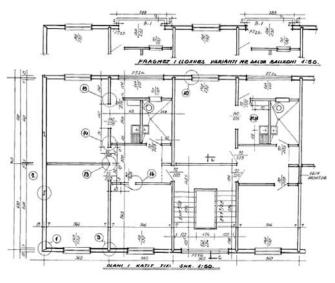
Plan of Module 1 with lodge and balcony © AQTN
